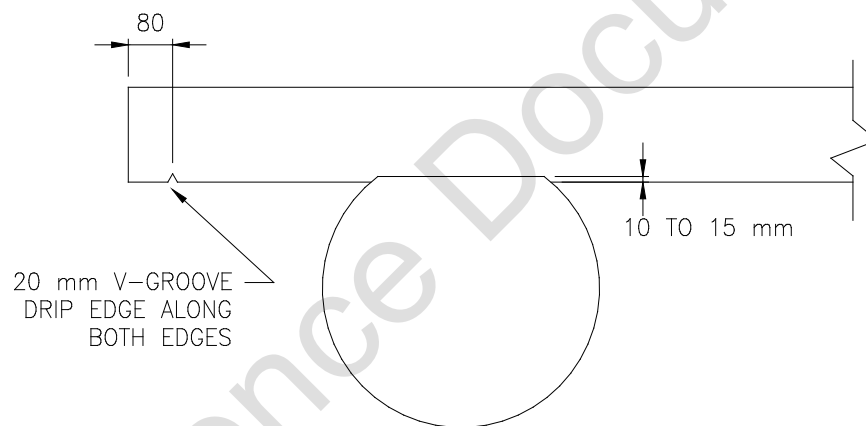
Drip Edge and Concrete Level
